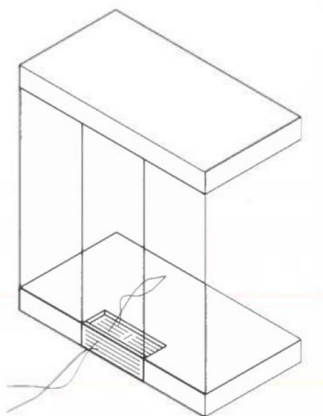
| Schematic illustration of a facade where the air enters the room through a ventilation opening low to the floor | Source: (Knaack et al., 2007)
